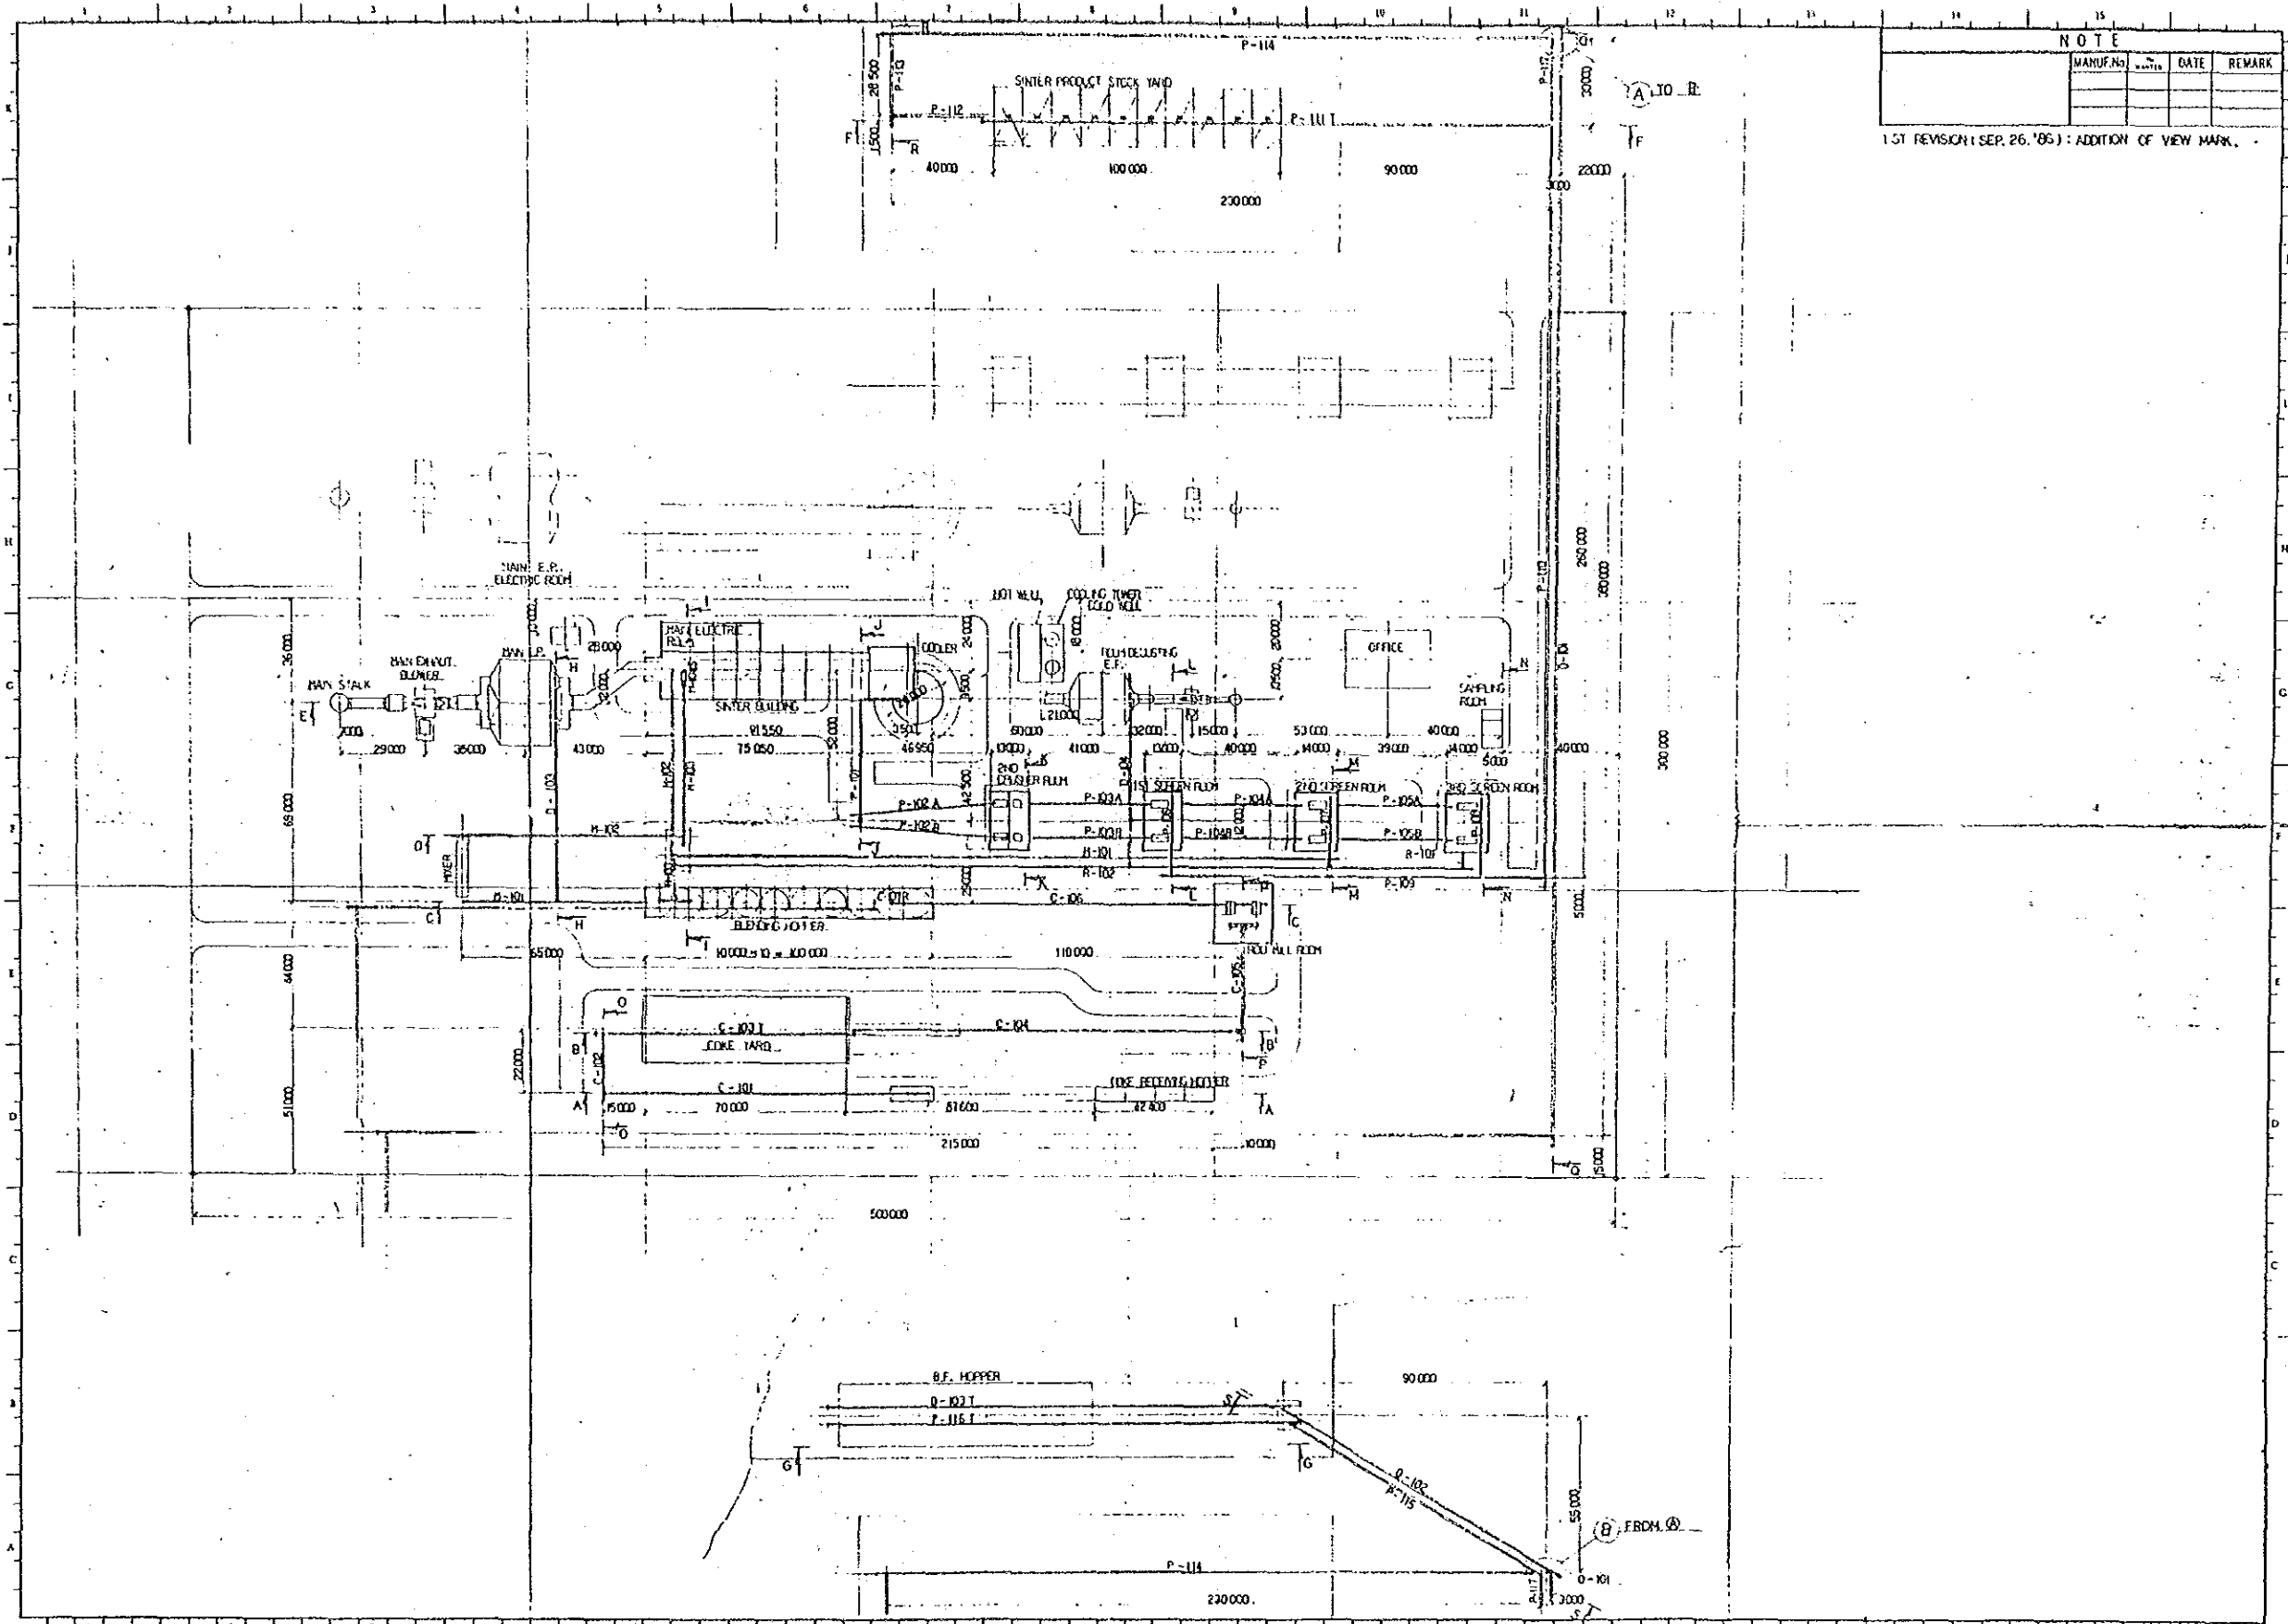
210m² DL type sinter plant layout (plan)
